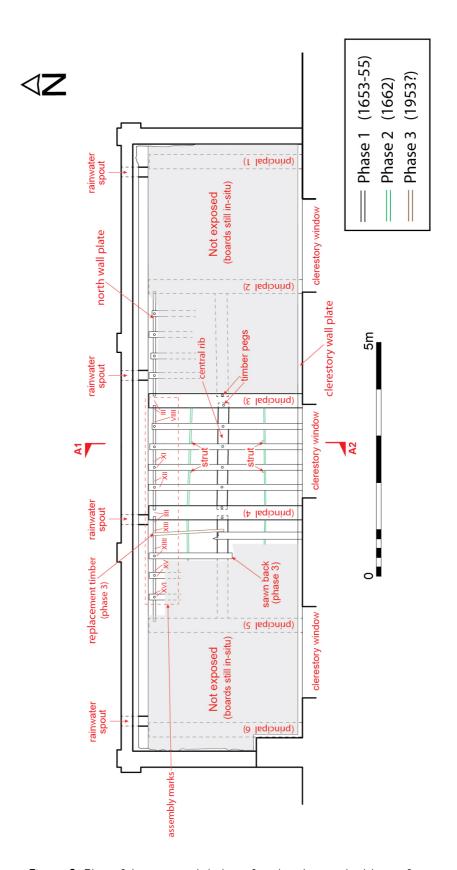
Plan of the exposed timbers forming the north aisle roof.
